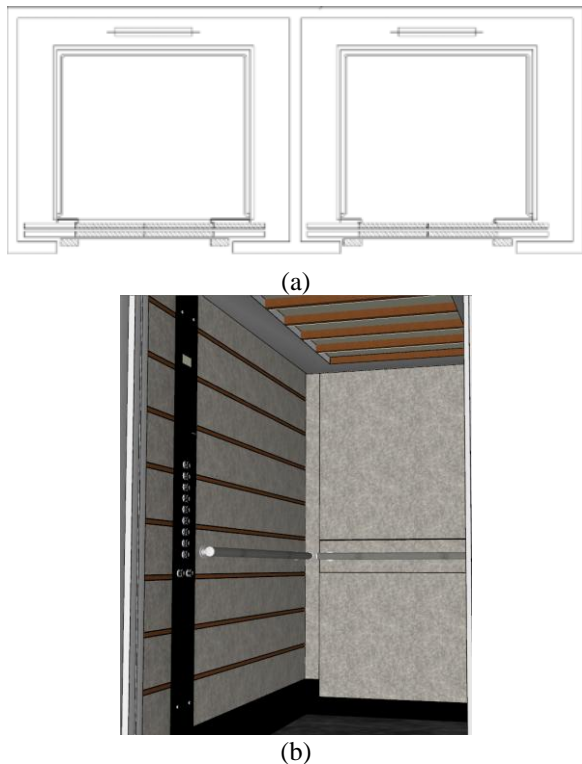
(a) Elevators Plan, (b) Elevators Perspective
